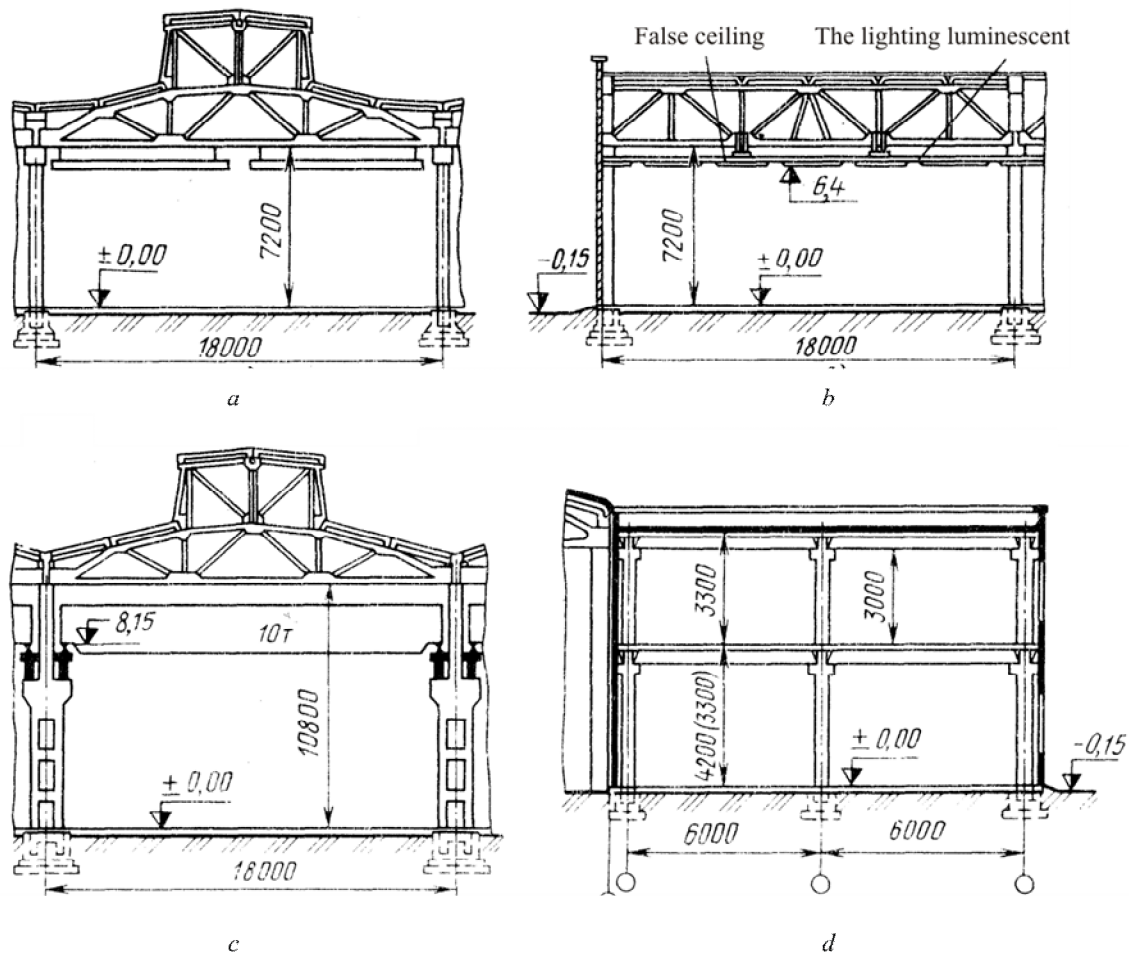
Sectional plans of buildings [1]: a – a building without cranes having roof monitors; b – a building without cranes having a flat roof and a counter ceiling; c – building cranes; d – an annexe to an industrial building for administrative and welfare buildings
